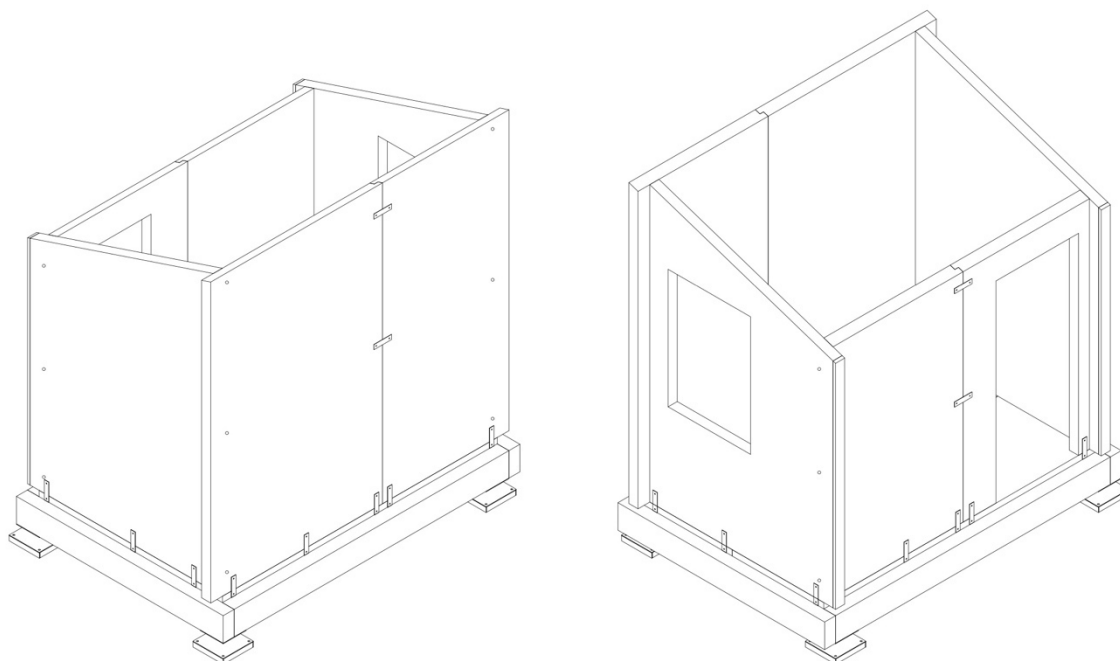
and 4. Walls panels from Portugal pilot action in new construction (Interconnected system panels).
